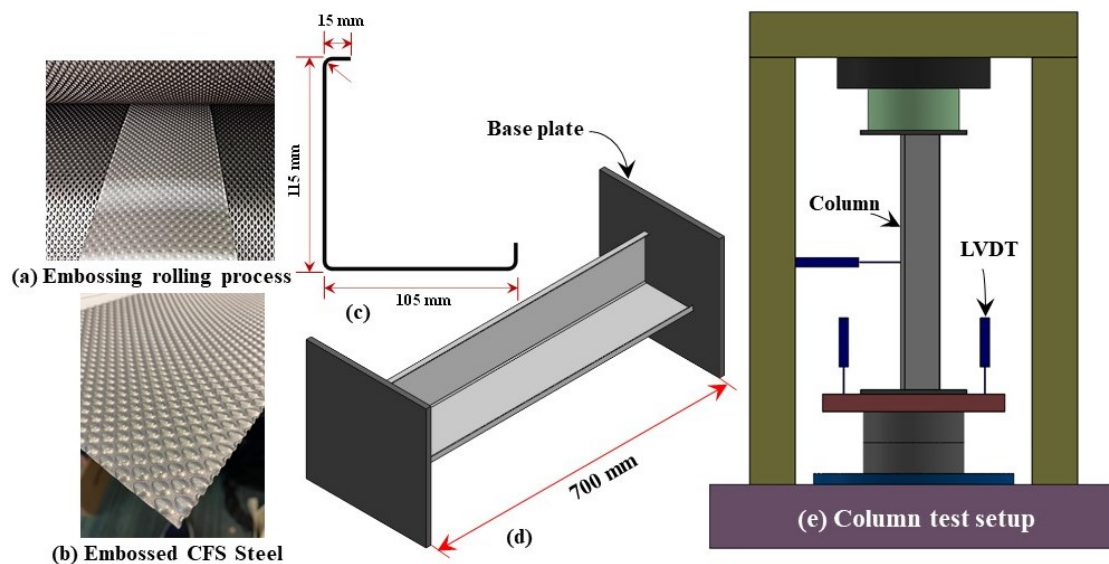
(a) Embossment process; (b) Embossed steel plate; (c) Cross-section of the angle section; (d) 3D view of the column member and (e) Test setup.
